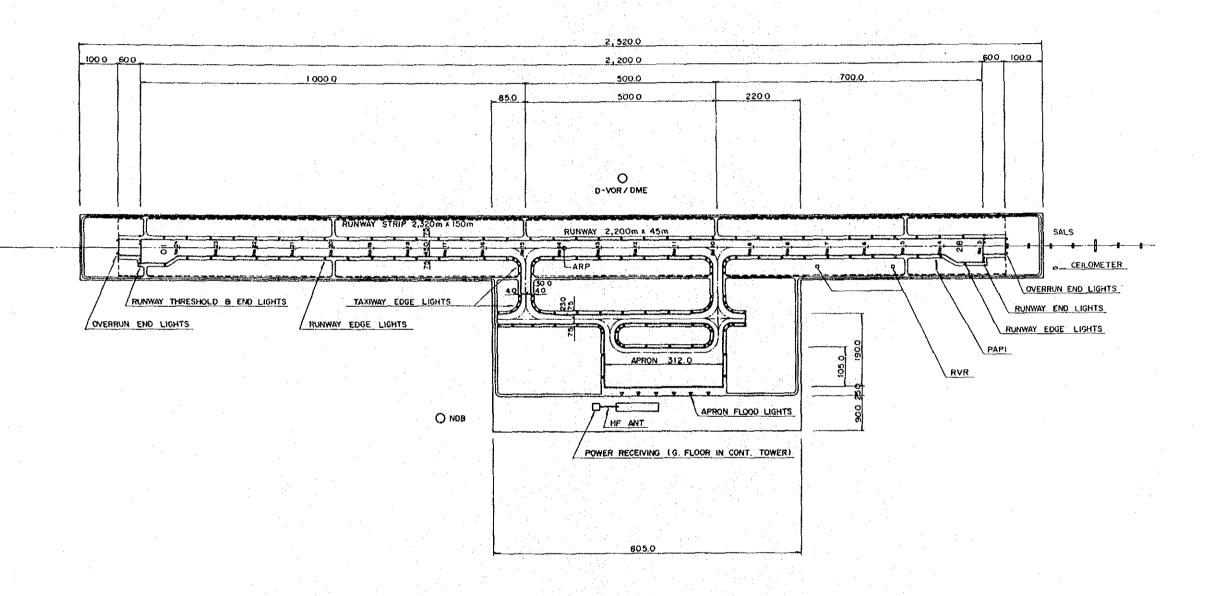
Proposed Naviaids Plan for Short Term Development
